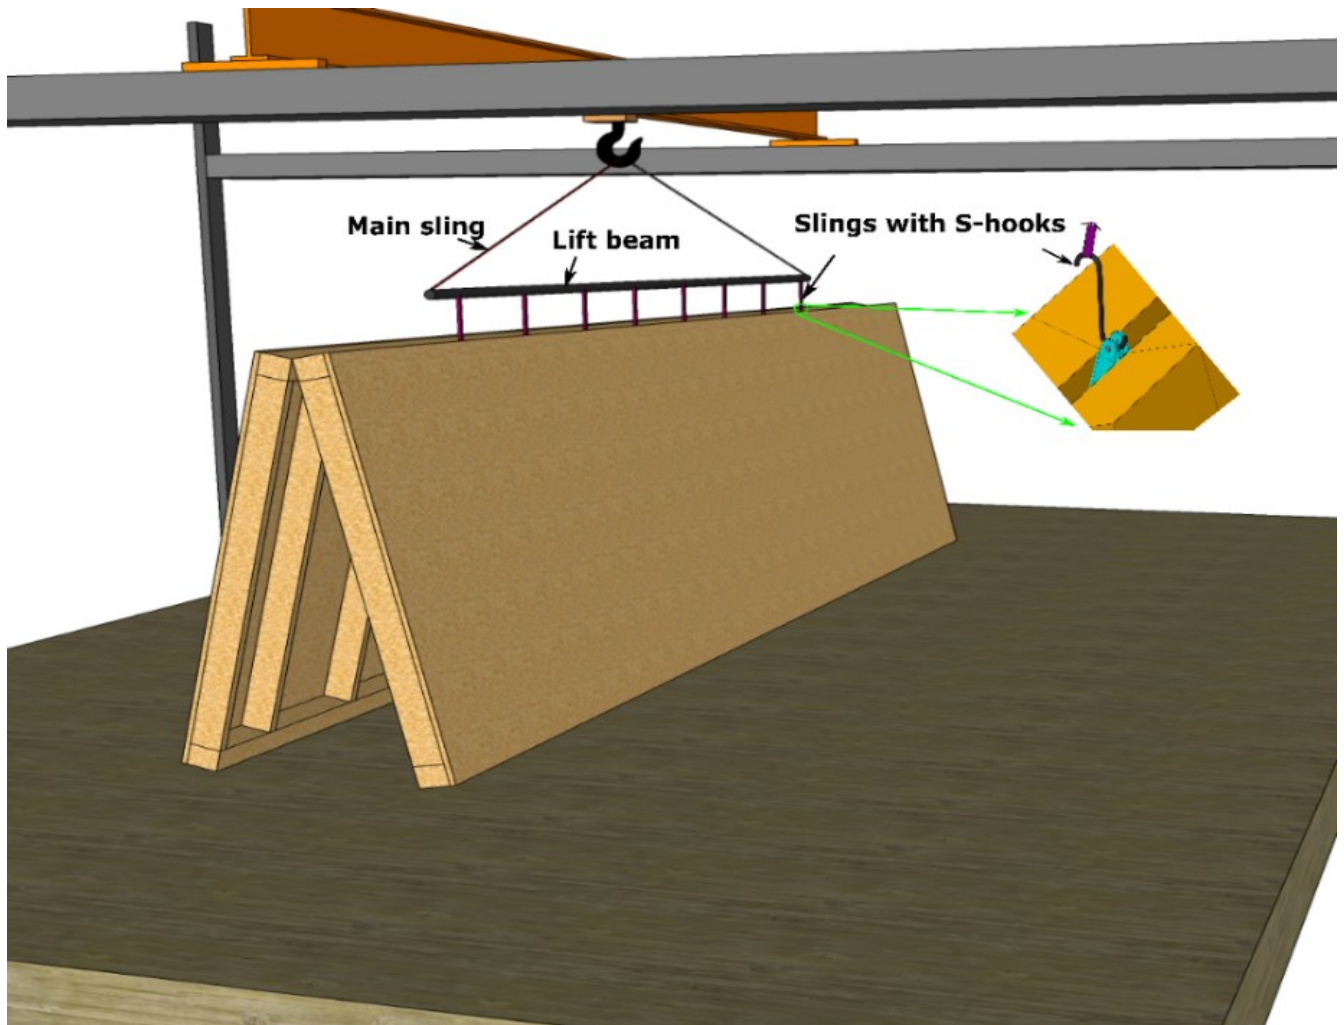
Attaching rigging slings with S-hooks to the panel assembly.
